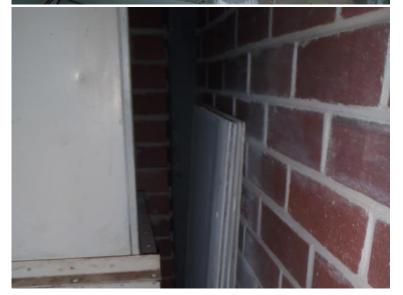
Backing board to electrical box in Shop 27A (assumed asbestos containing).
